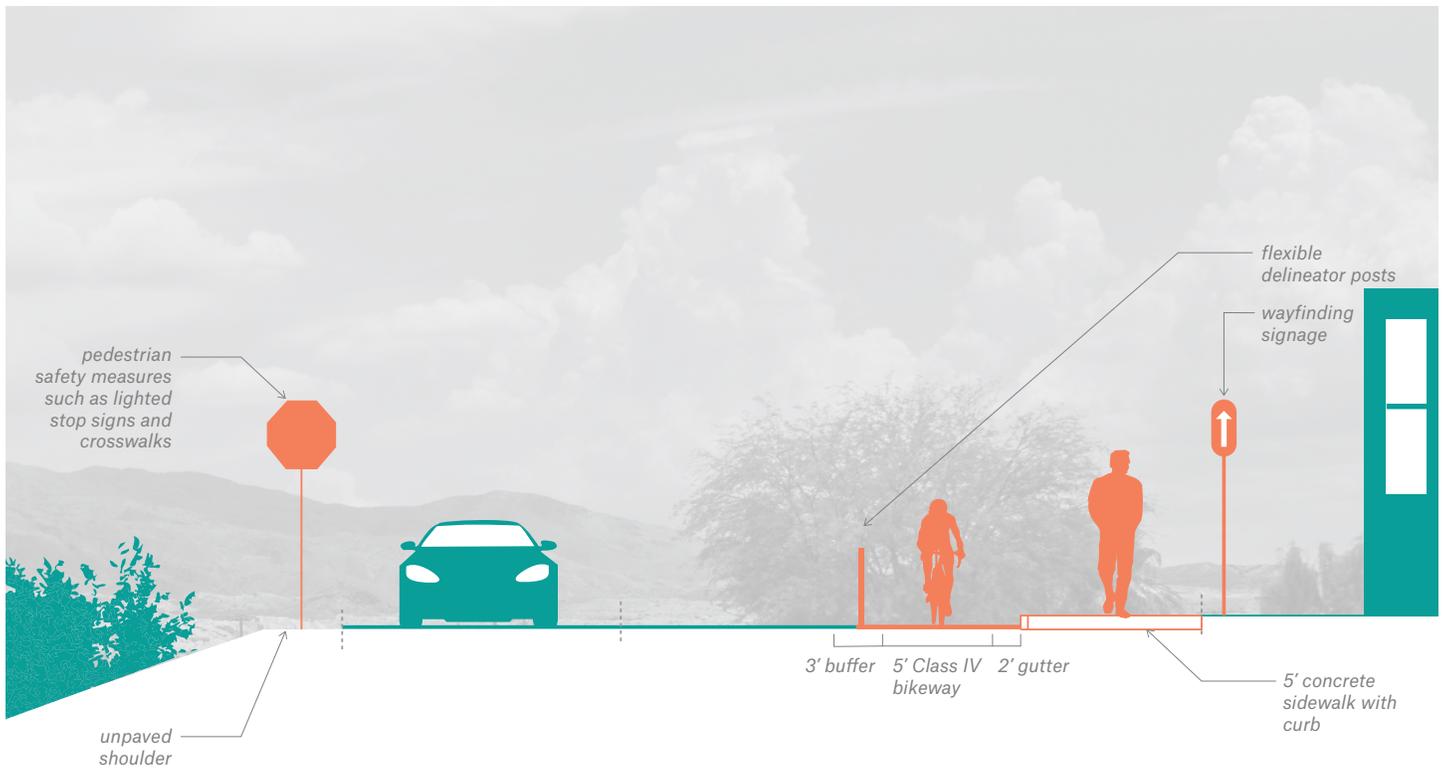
Typical Cross-Section: 5-foot Wide Sidewalk with Class IV Protected Bikeway
